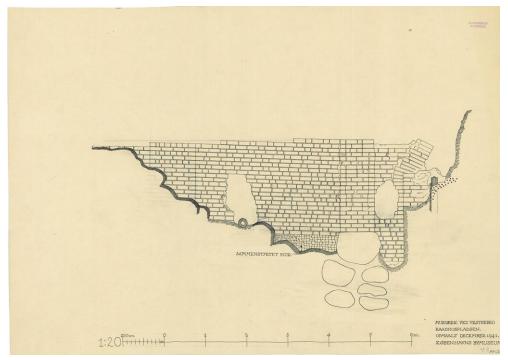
An elevation drawing of part of the brick bridge over the medieval moat made in 1941 during the toilet building construction.
